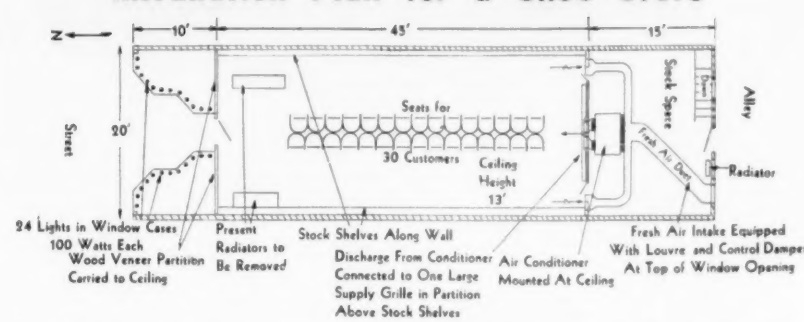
shows the plan for a commercial installation such as a shoe store or similar retail establishment.
